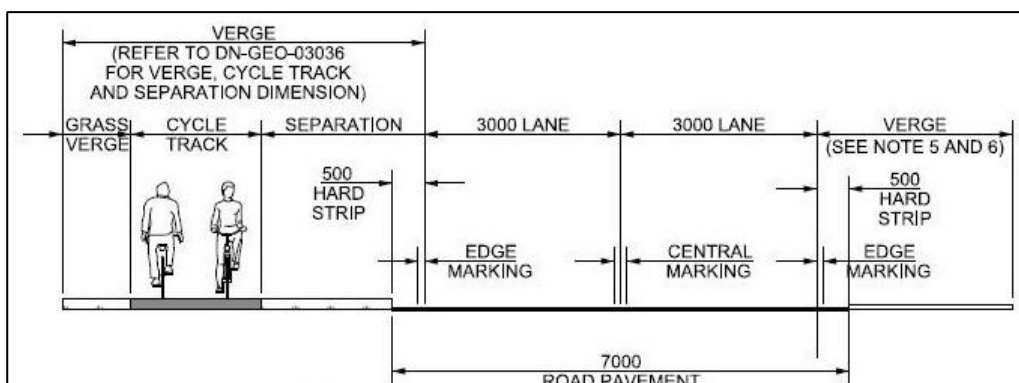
Type 3 Single Carriageway Side Road Cross Section
